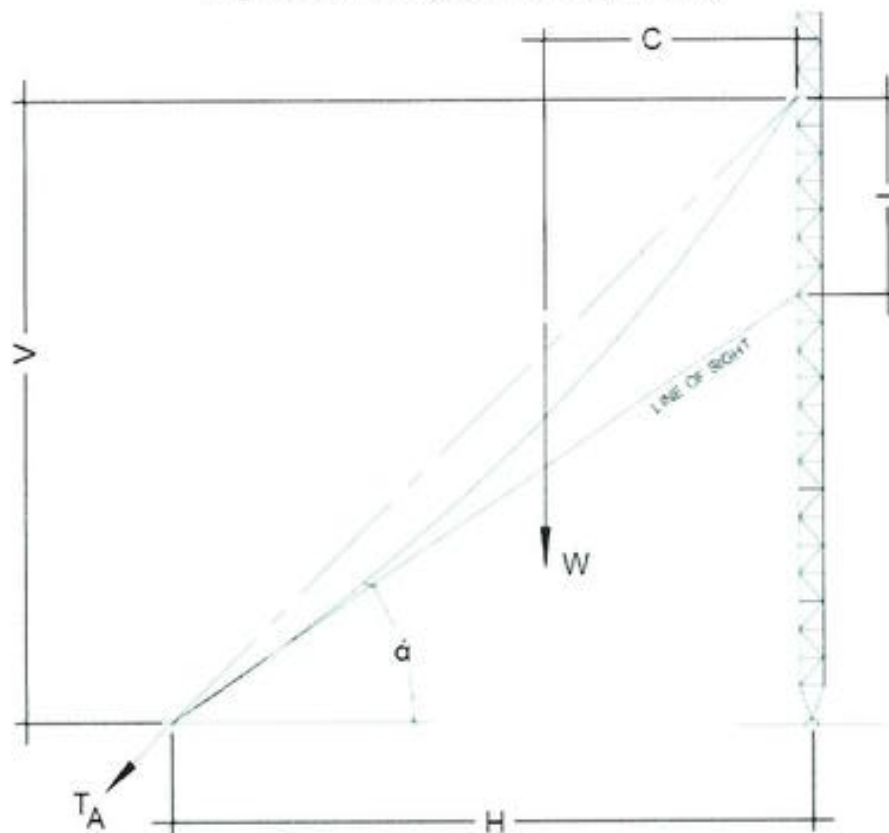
Guy Tensions at Anchor and at Mid-Guy
